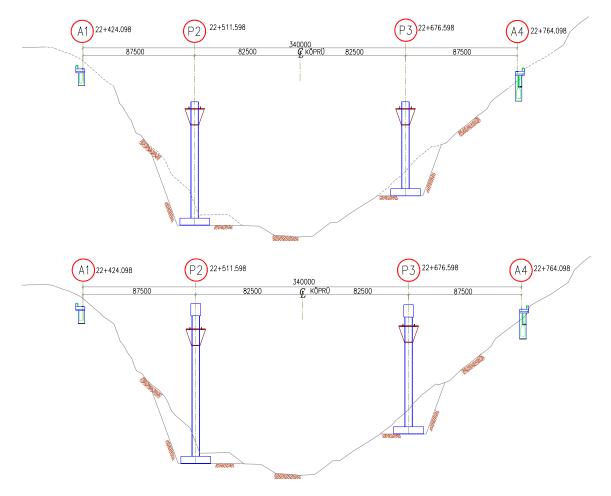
Schematic drawing of balanced cantilever construction (DOLSAR 2007)
